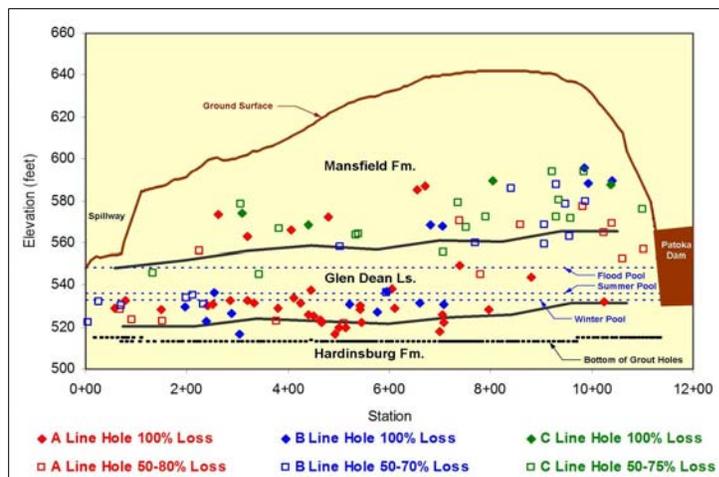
Downstream-looking cross section of the left abutment of Patoka Dam showing drill water losses.
